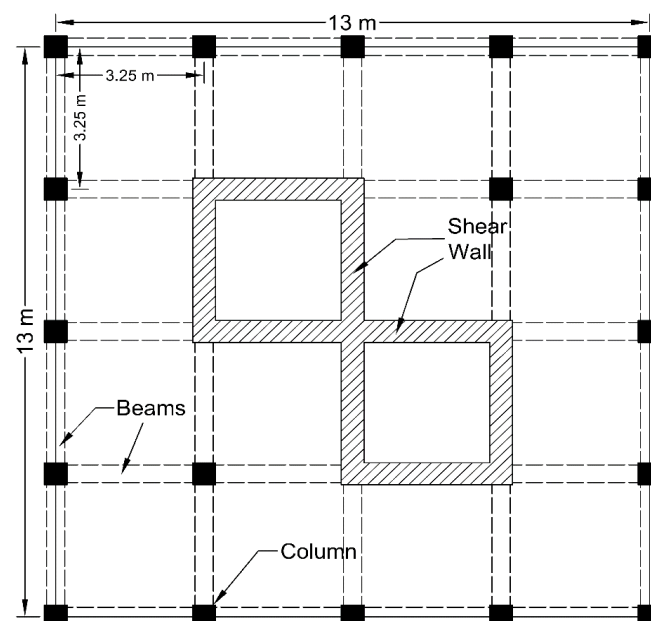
Detailed plan of the reference floor of the multi-story building in this study.
